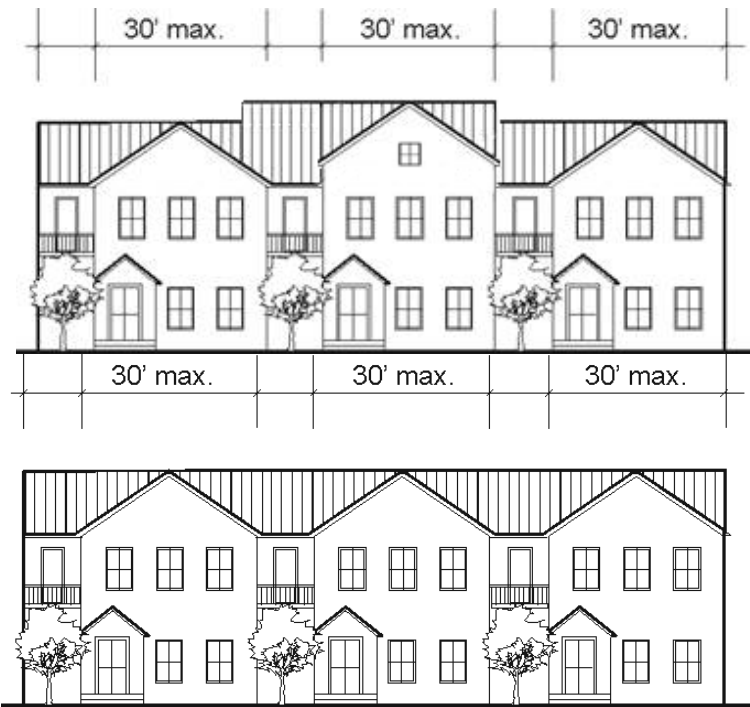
Articulate building facades at no more than 30-foot intervals.
